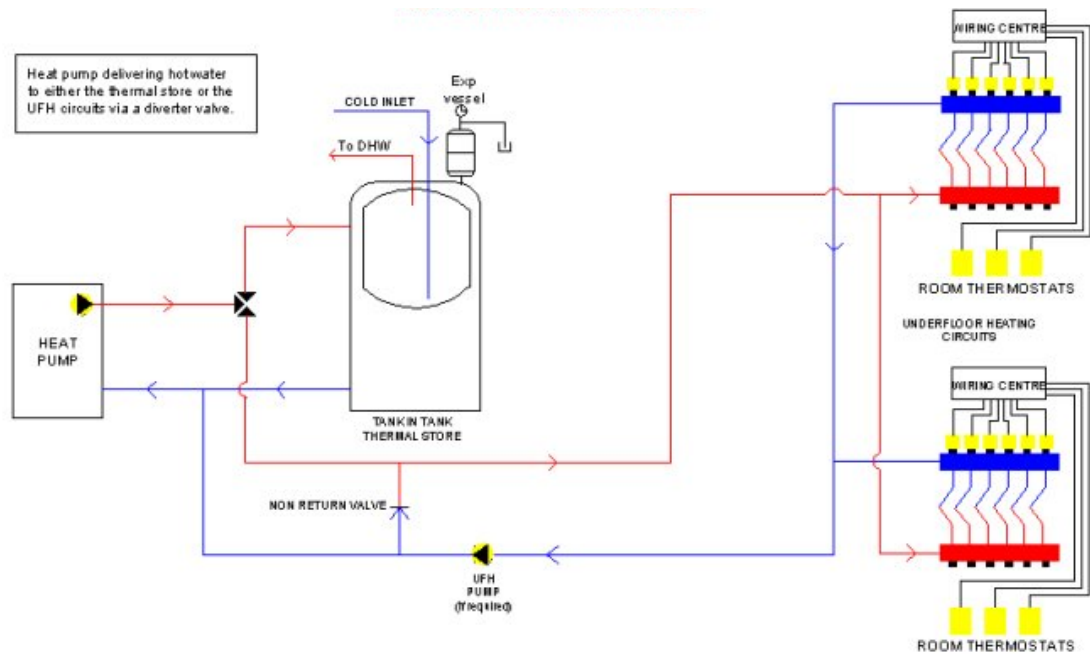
Heat pump with thermal store and underfloor heating zone /29/
